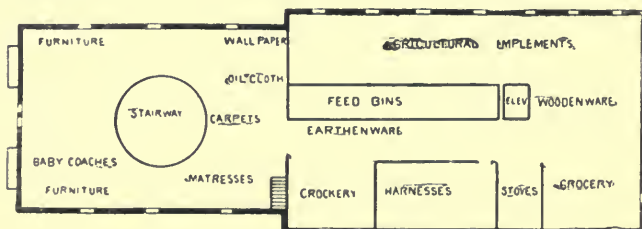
ARRANGEMENT OF SECOND FLOOR.
